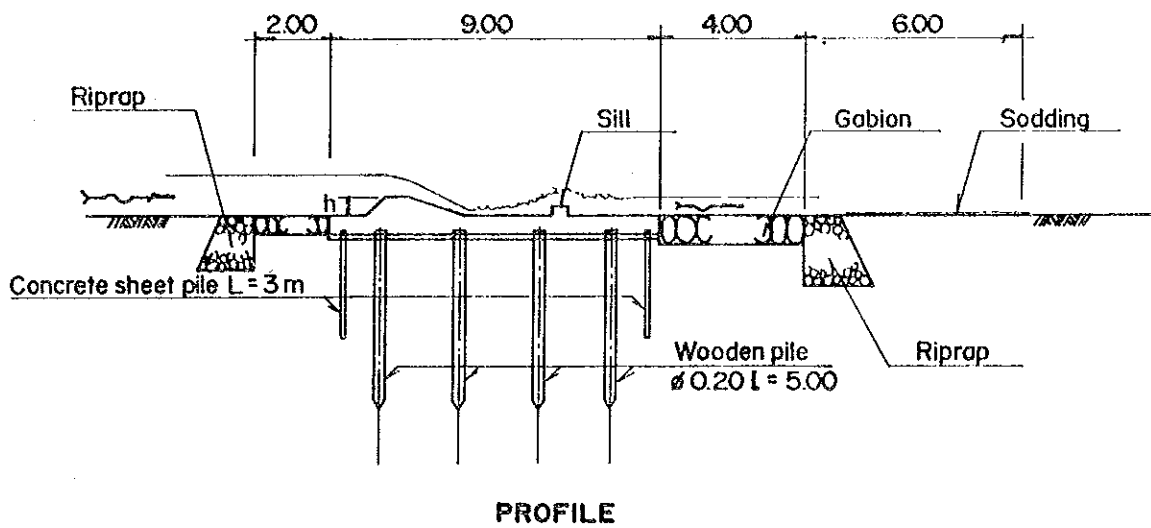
PROPOSED DRAINAGE SLUICE IN WIDAS RETARDING BASIN ( LEFT SIDE ) ( 2/4 )
